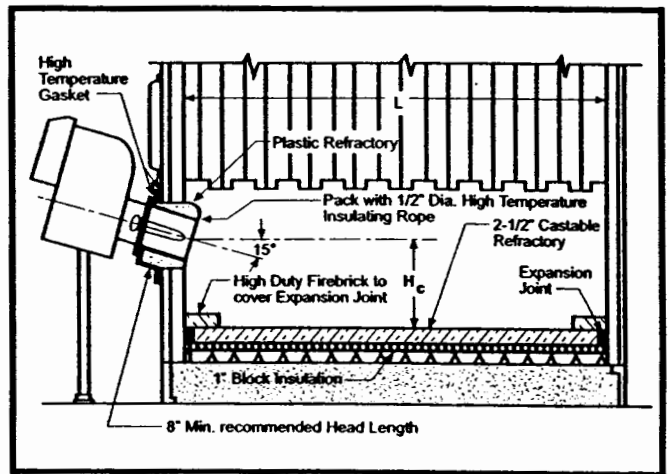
Type "R" Burner Installation Firing Cast Iron Boiler with Single Door
